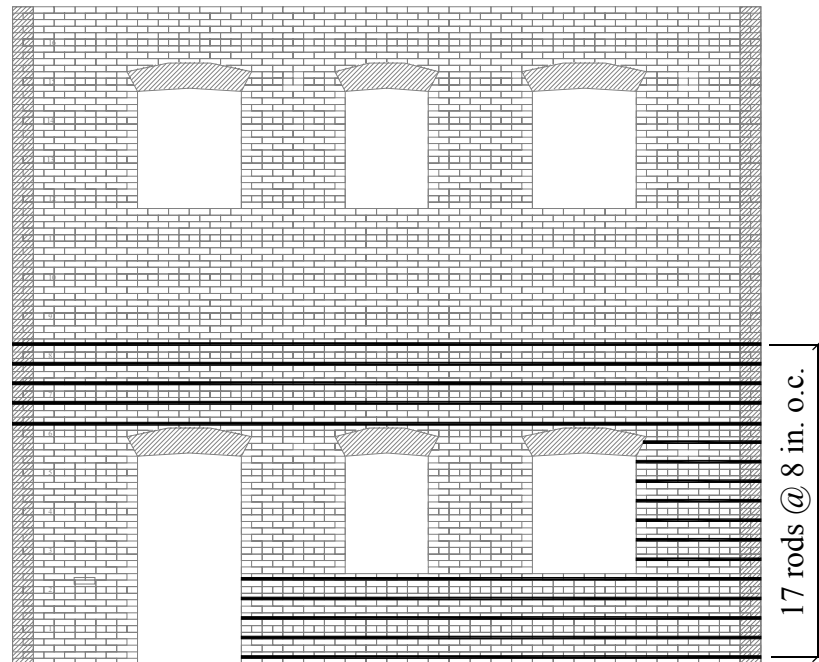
Schematic of the NSM retrofit scheme applied to the outside of Wall B
